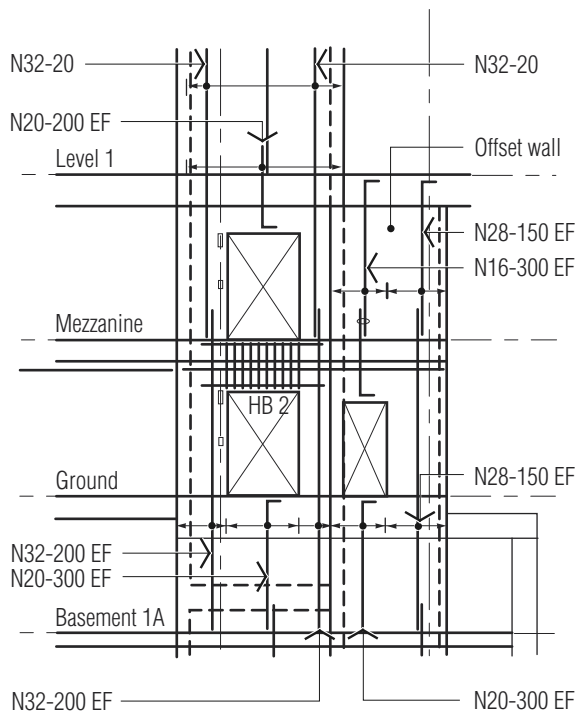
This figure shows a heavily reinforced core wall with a header beam under the door openings and heavy vertical reinforcement in each face.
